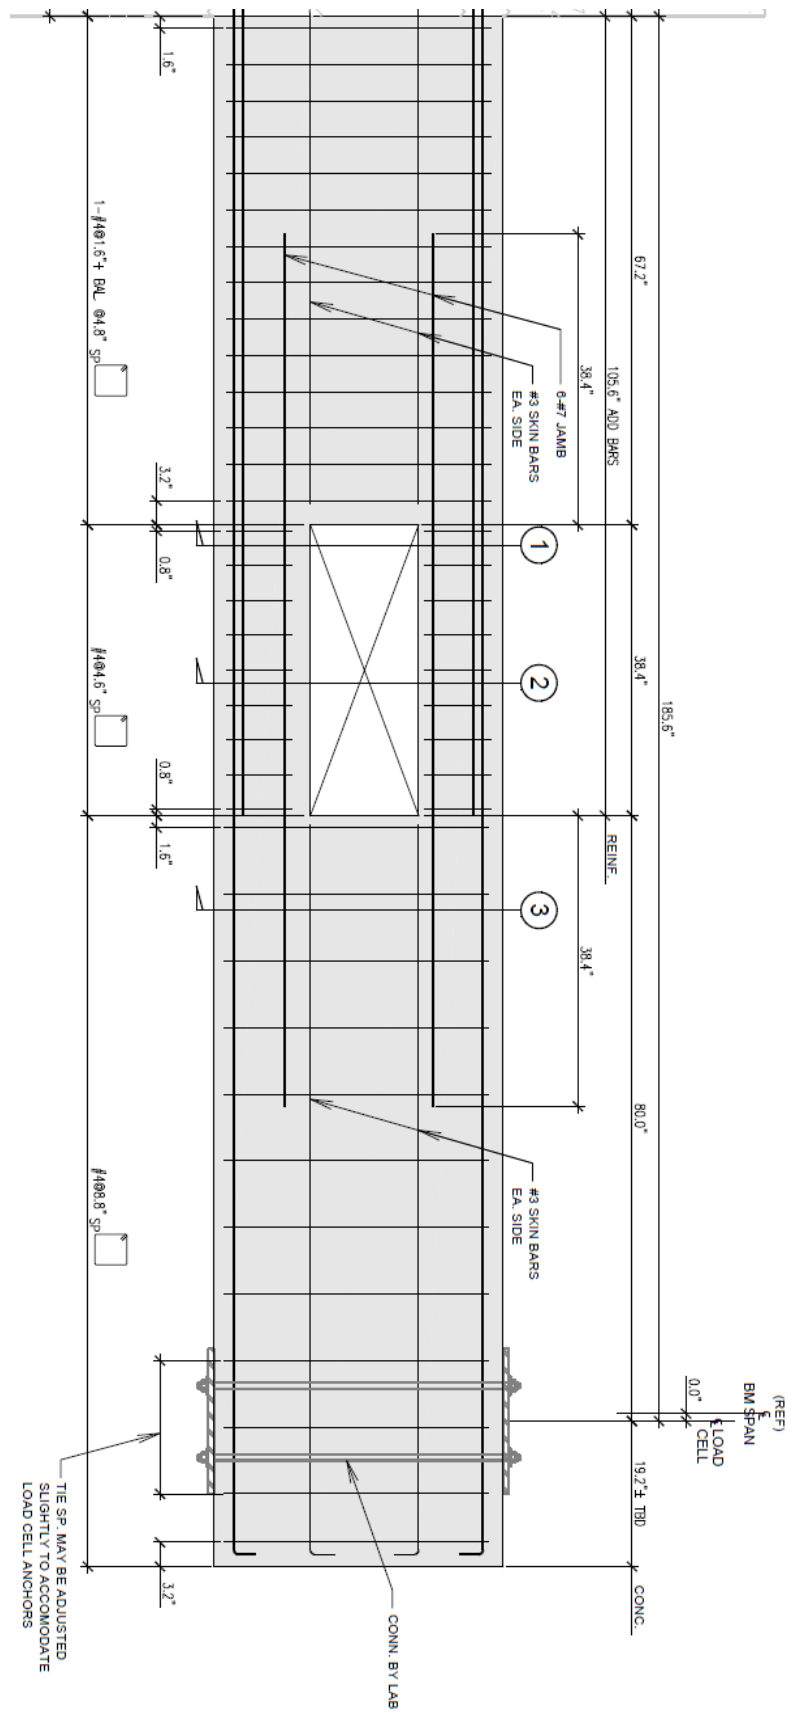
Side elevation of Specimen 6 (Lemnitzer et al., 2013).
